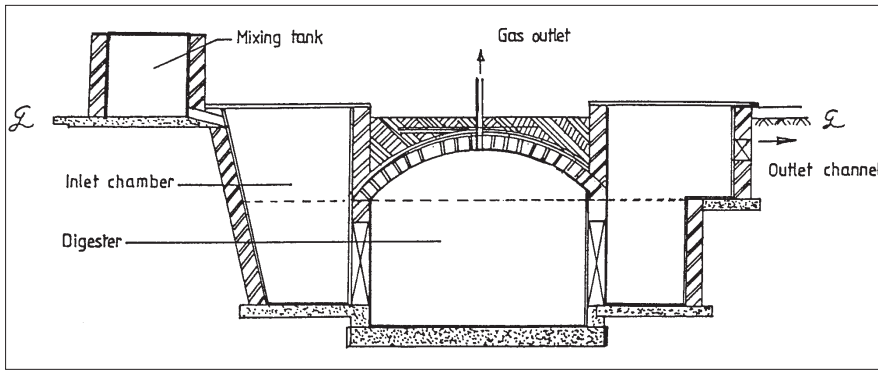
Schematic of popular fixed dome type Janta biogas plant
